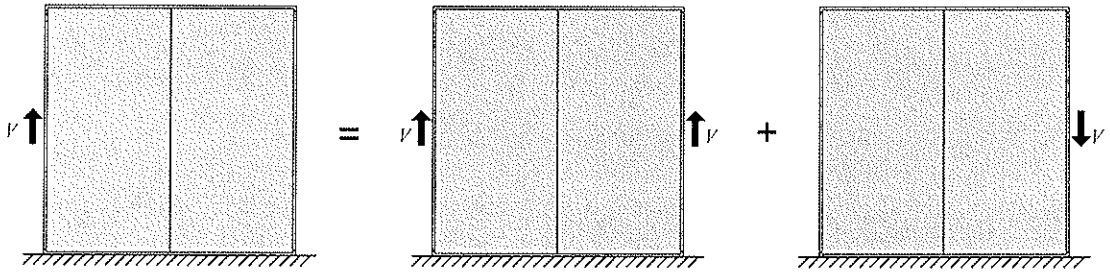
Original transverse wall subjected to vertical uplift is divided into two sub-cases.
